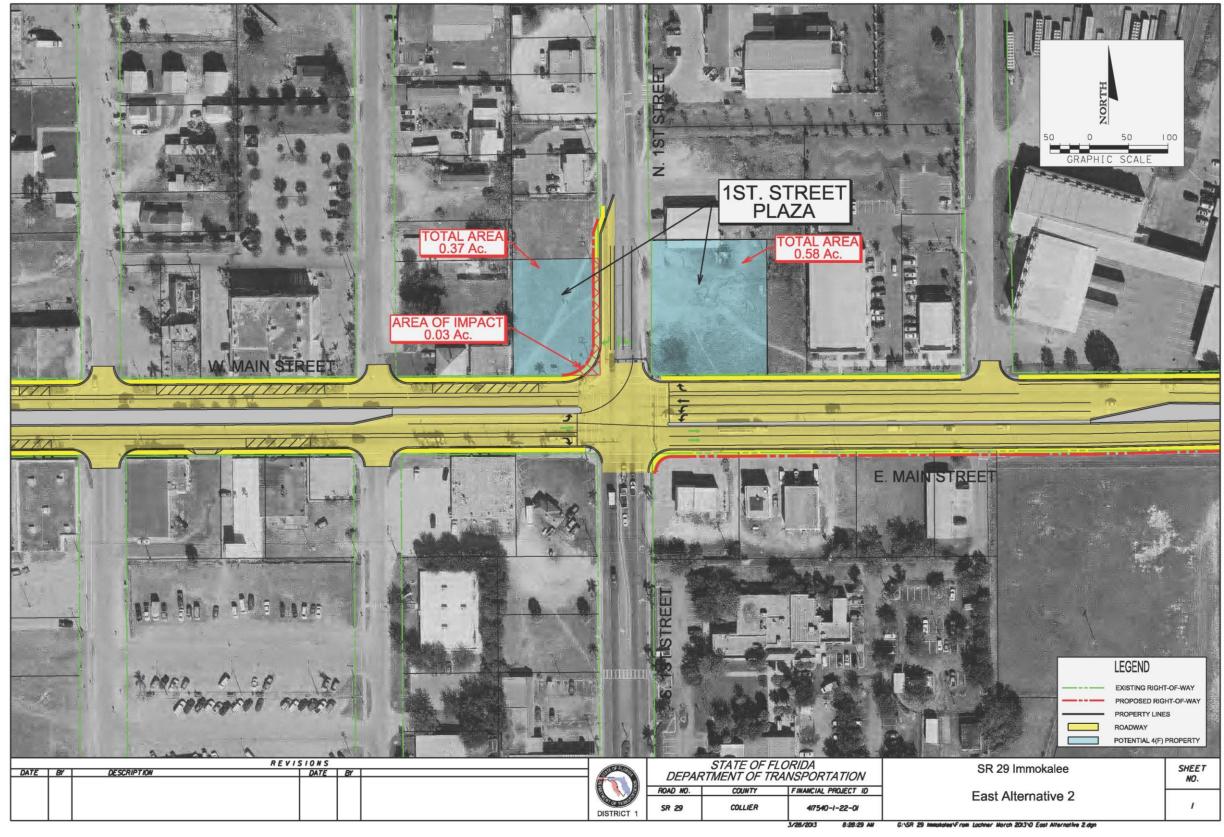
EAST ALTERNATIVE #2 POTENTIAL IMPACT TO THE 1ST STREET PLAZA
